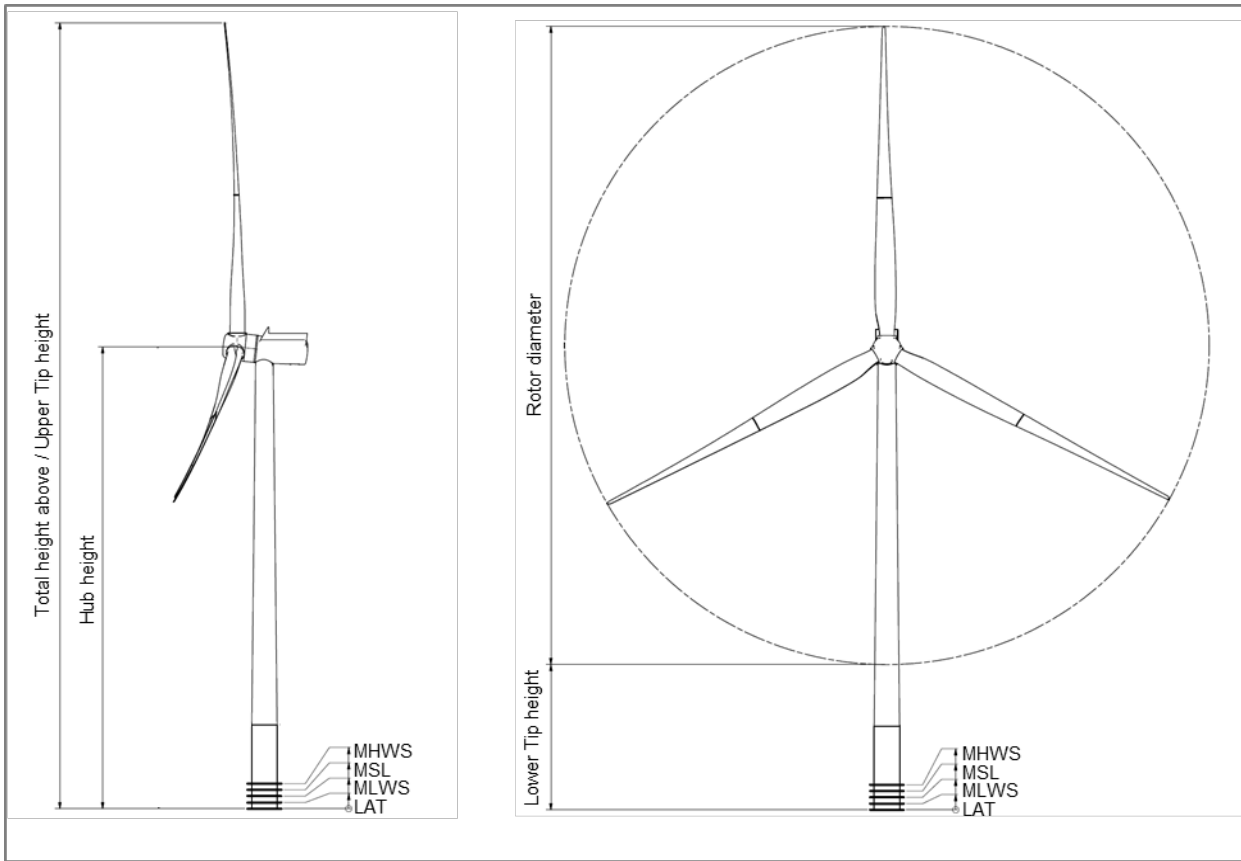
WTG elevation drawing stating main parameters.
